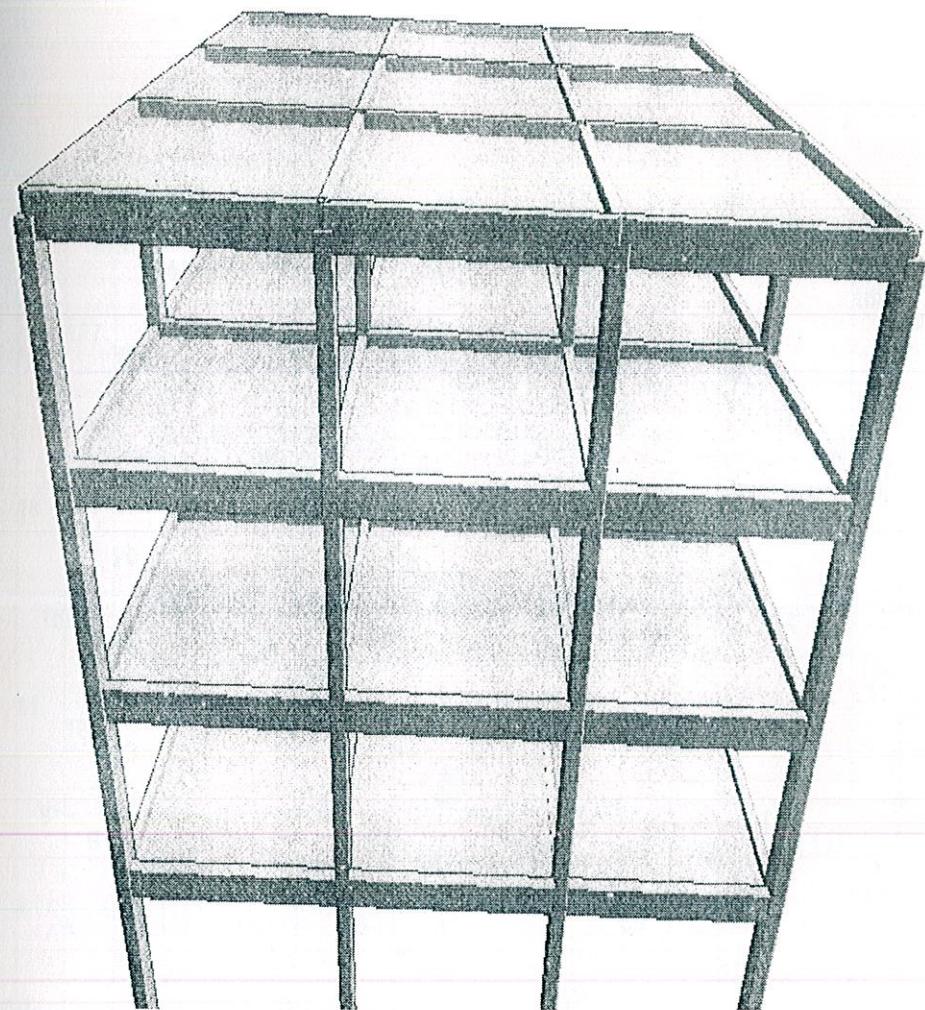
Final 3-D Model of the earthquake resistant multistorey building
